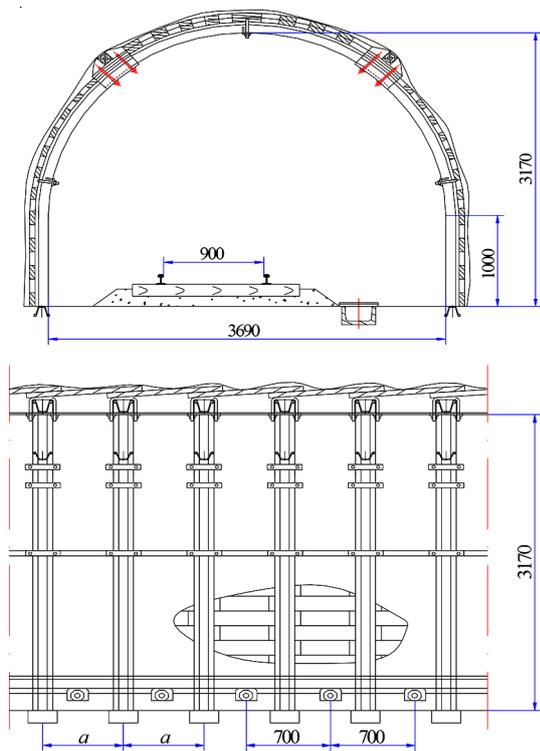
SVP-22 steel arch support passport with steel arch distance 0.7 m (one-lane railway roadway)
